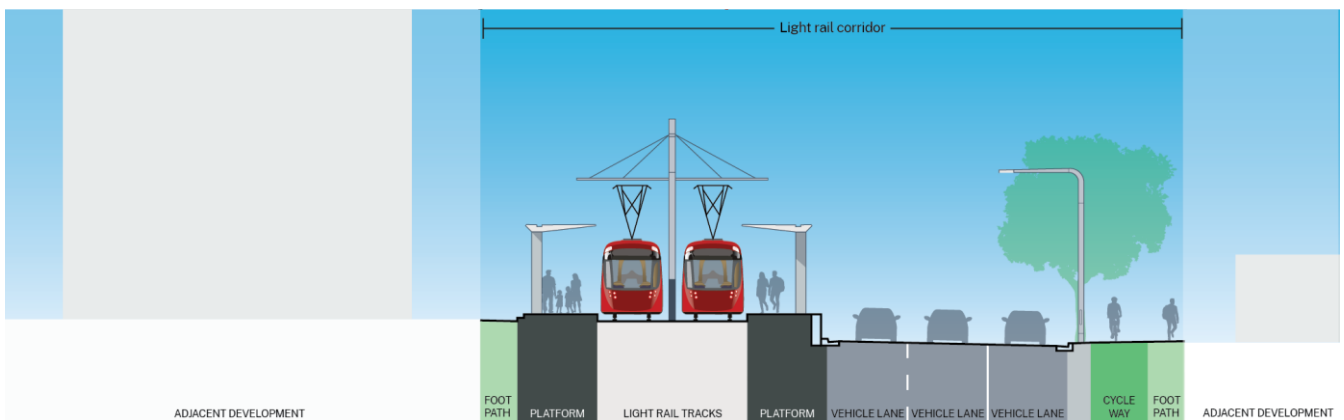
Indicative cross section of an on-road (segregated) arrangement with stop adjacent to general traffic lanes
